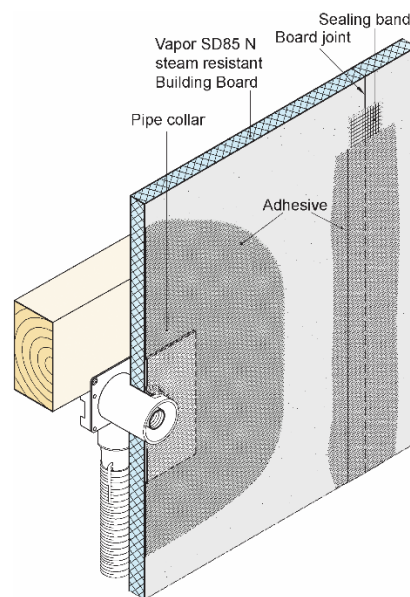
Principle for waterproofing around pipe penetrations and over joints
